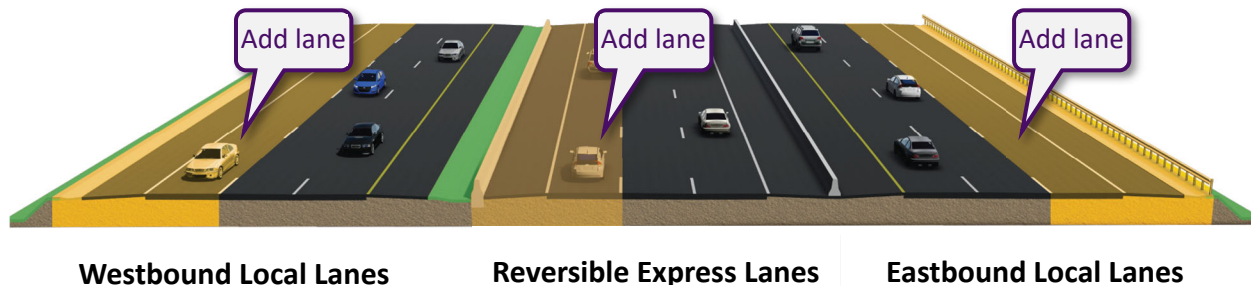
Build Alternative Typical Section (78th Street to I-75)
